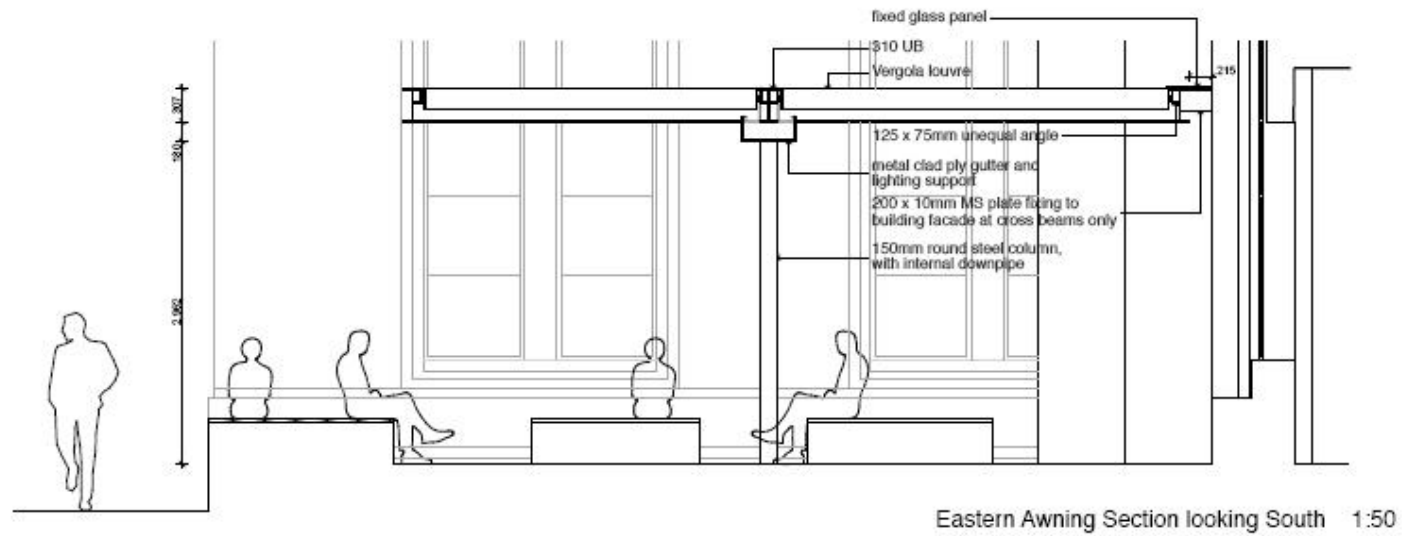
Detailed section of proposed awnings to Level 1 terraces
